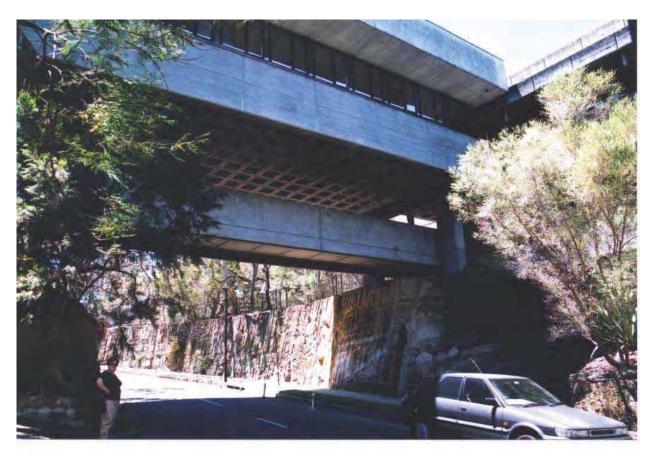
Elevated building over the walkway to Stage Three, KCAE c. 1990s
